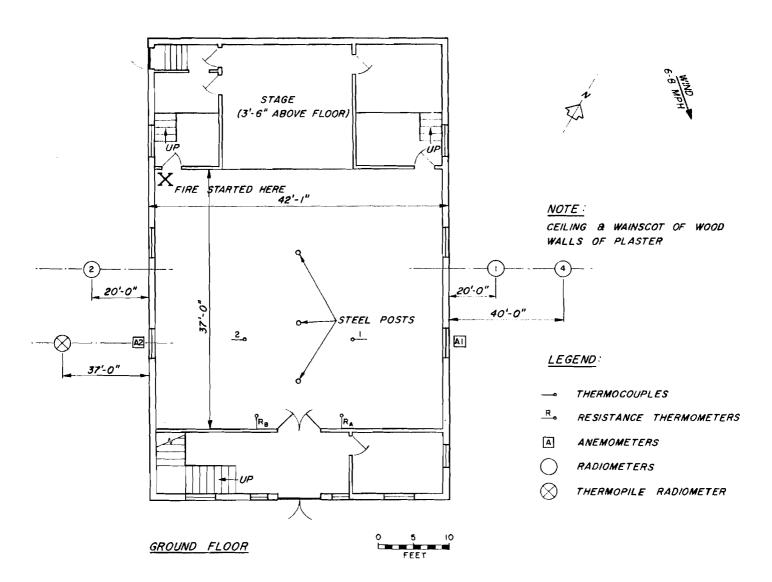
BUILDING No. 6 - TWO - STOREY SOLID BRICK
